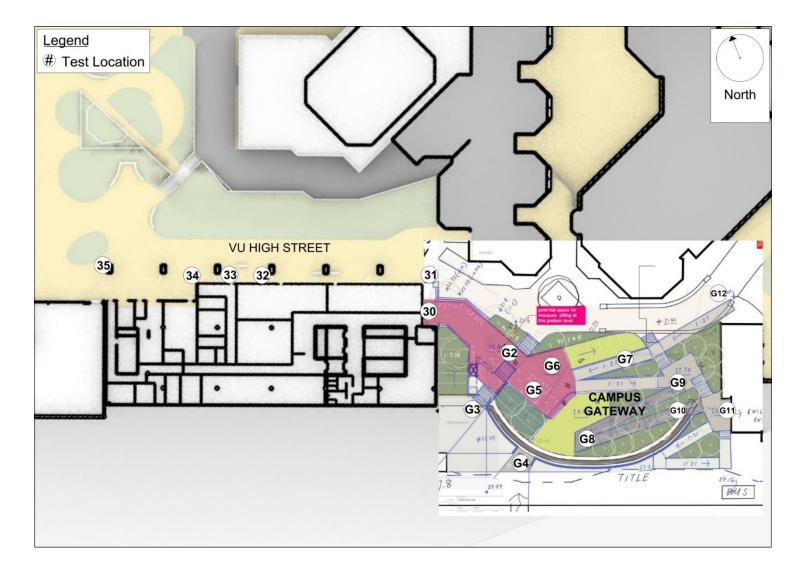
Test Locations along the VU High Street Frontage and Campus Gateway Open Space of the proposed VU CHTF Development.
